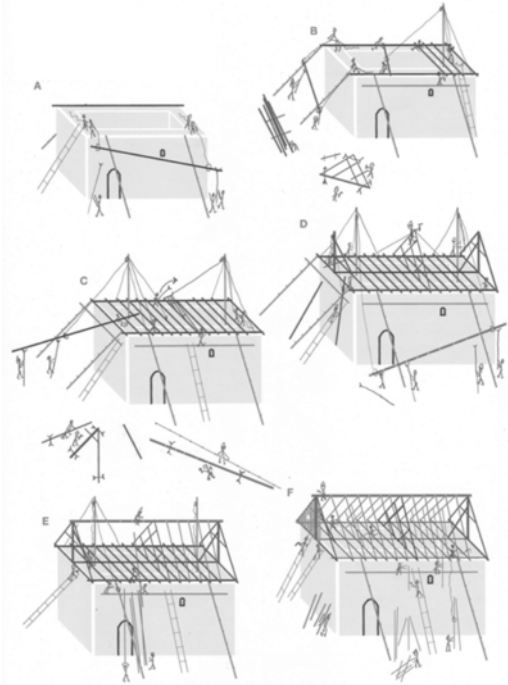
Interpretation of the “chaîne opératoire” in erecting the Edåsa nave roof. A. Placing the wall plates. B. Placing the tie beams and assembling the mid-truss. C. Raising the mid-truss and placing the steering plate. D. Placing the king posts and raising the ridge purlin. E. Placing the rafters. F. Placing the struts. Drawing. M. Hallgren.
